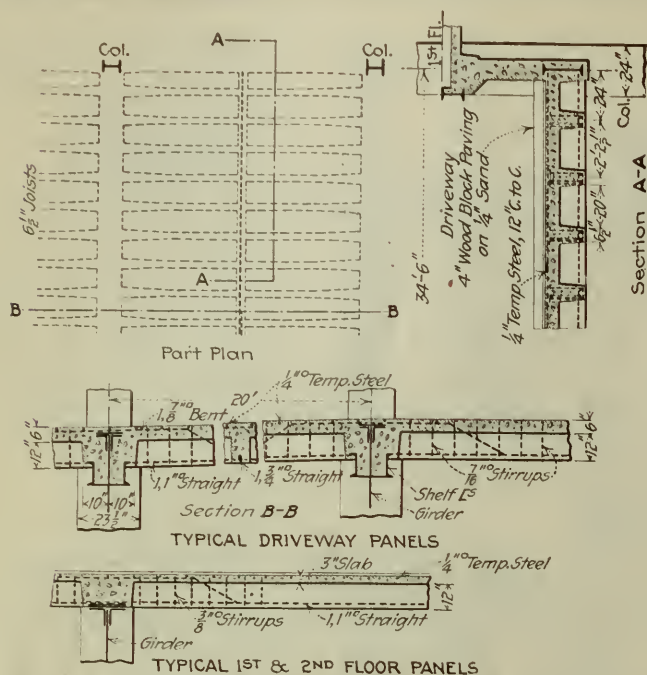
CONCRETE FLOOR AND DRIVEWAY CONSTRUCTION
